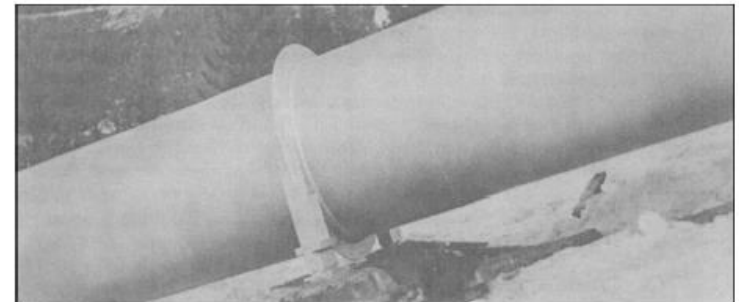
Ring girders provide support for 54-in. diameter pipe
